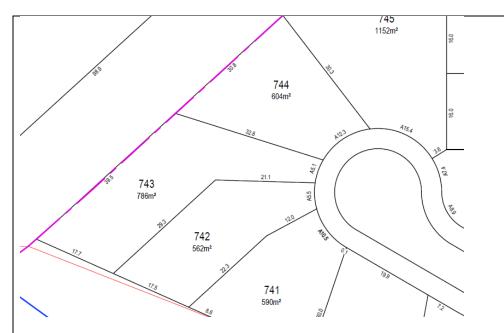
Excerpt from Lot Layout Plan by Maker ENG (dated 16/09/2022)
